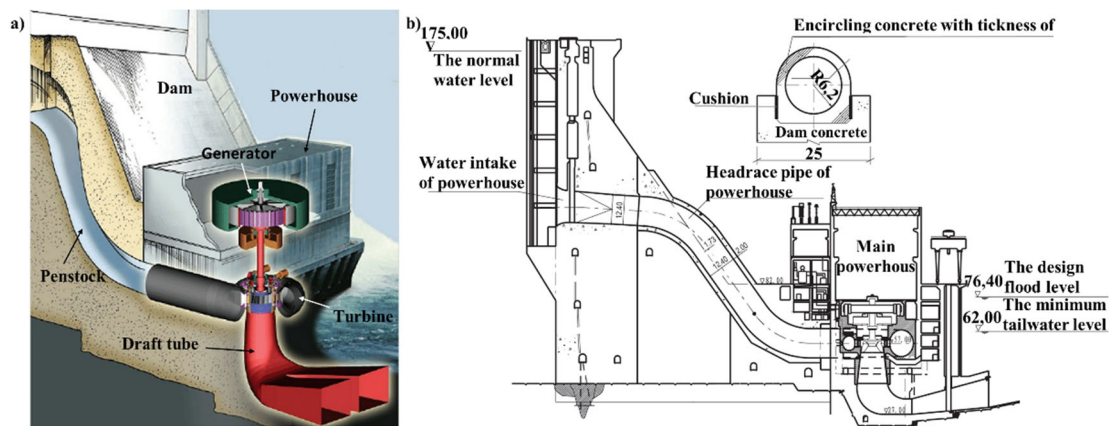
a) Powerhouse, [34] ; b) Schema of preset shallow slot for headrace penstock and reinforced concrete pipe with steel lining, [32].
